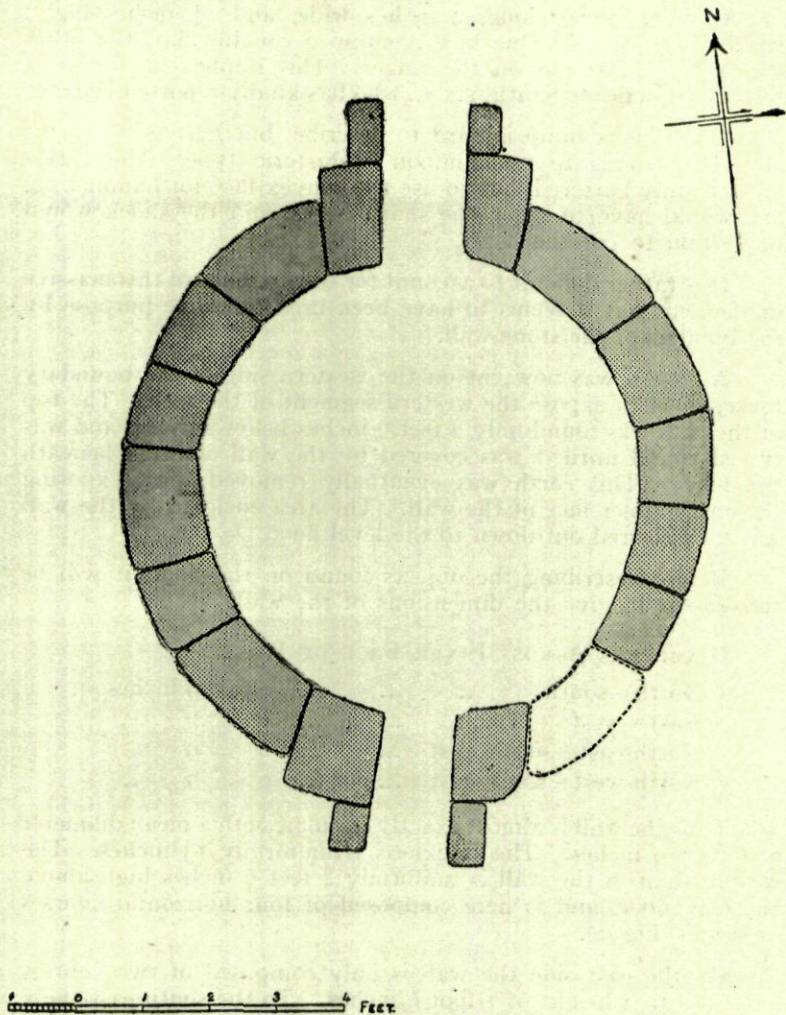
GROUND PLAN OF CIRCULAR STONE WALL.
